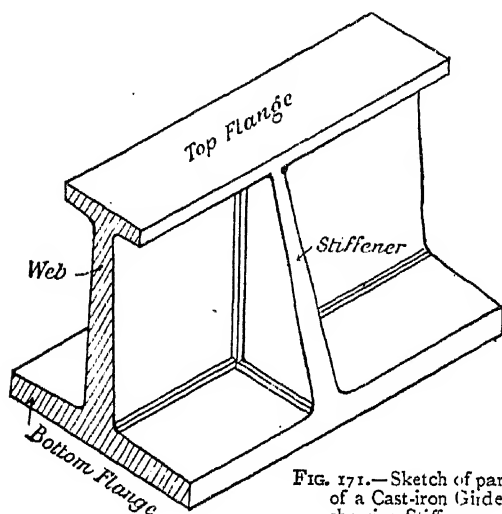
Sketch of part of a Cast-iron Girder showing Stiffener.
